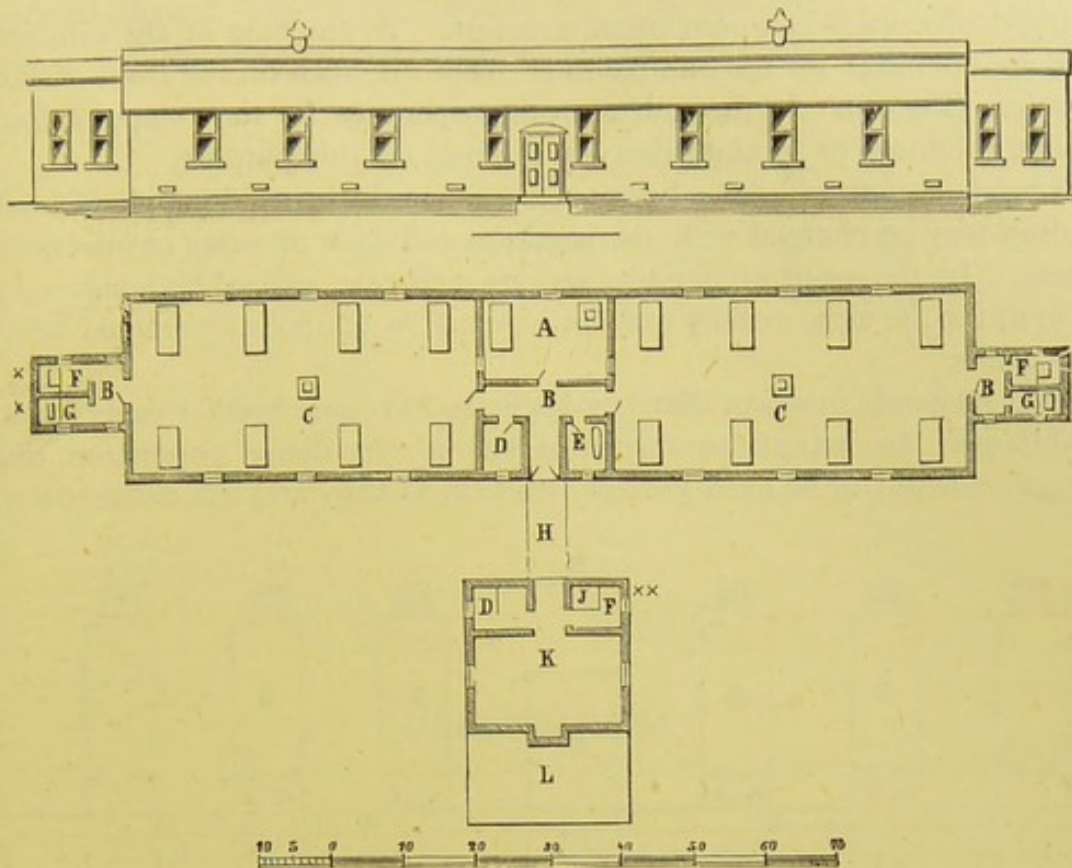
ELEVATION AND PLAN OF A SMALL HOSPITAL.
